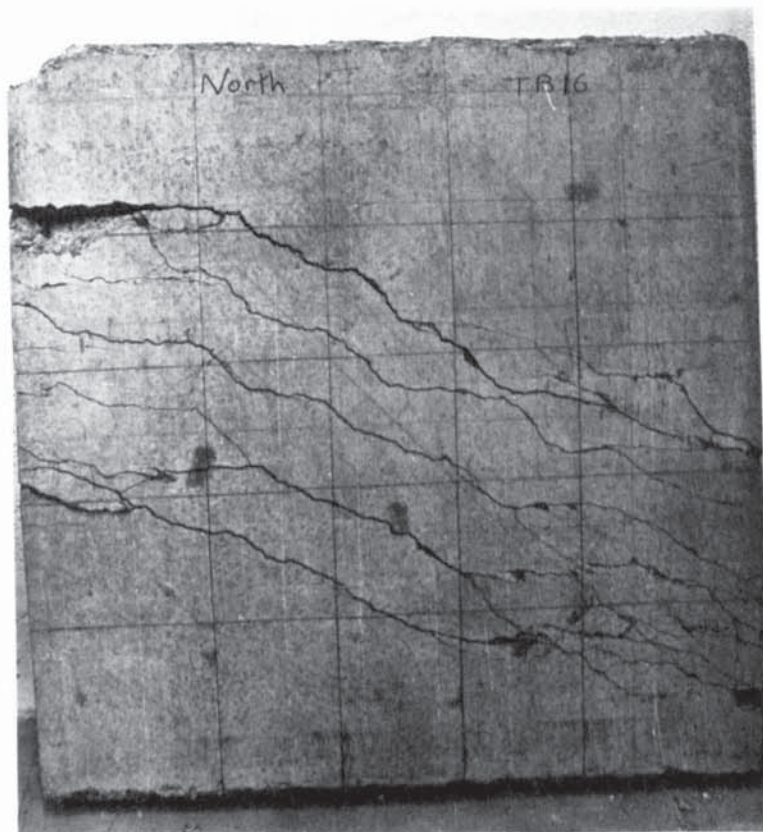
MULTIPLE CRACK FAILURE (SPECIMEN TB 16)
